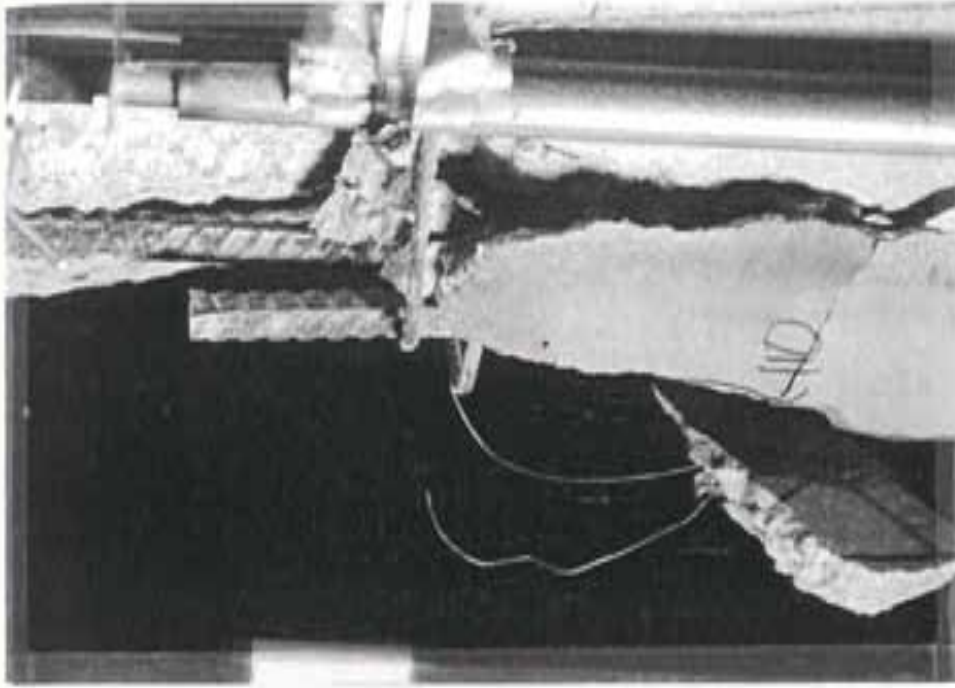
Opening of 90 degree hook in specimen S-WS-1
